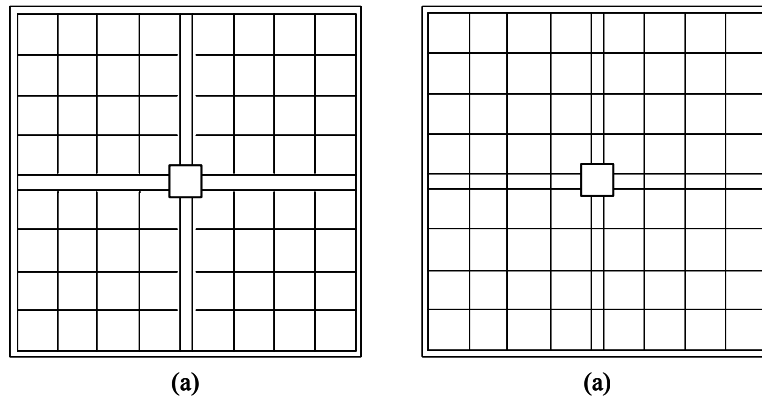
Bottom Steel Reinforcement Details (a) Control C-63; and (b) Control C-02
